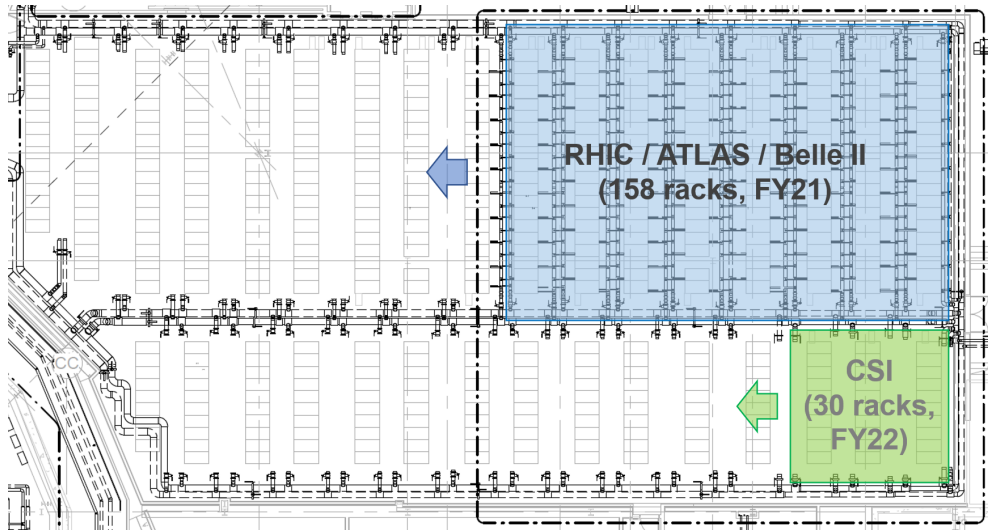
New Data Center – Main Data Hall (MDH) floor plan.
